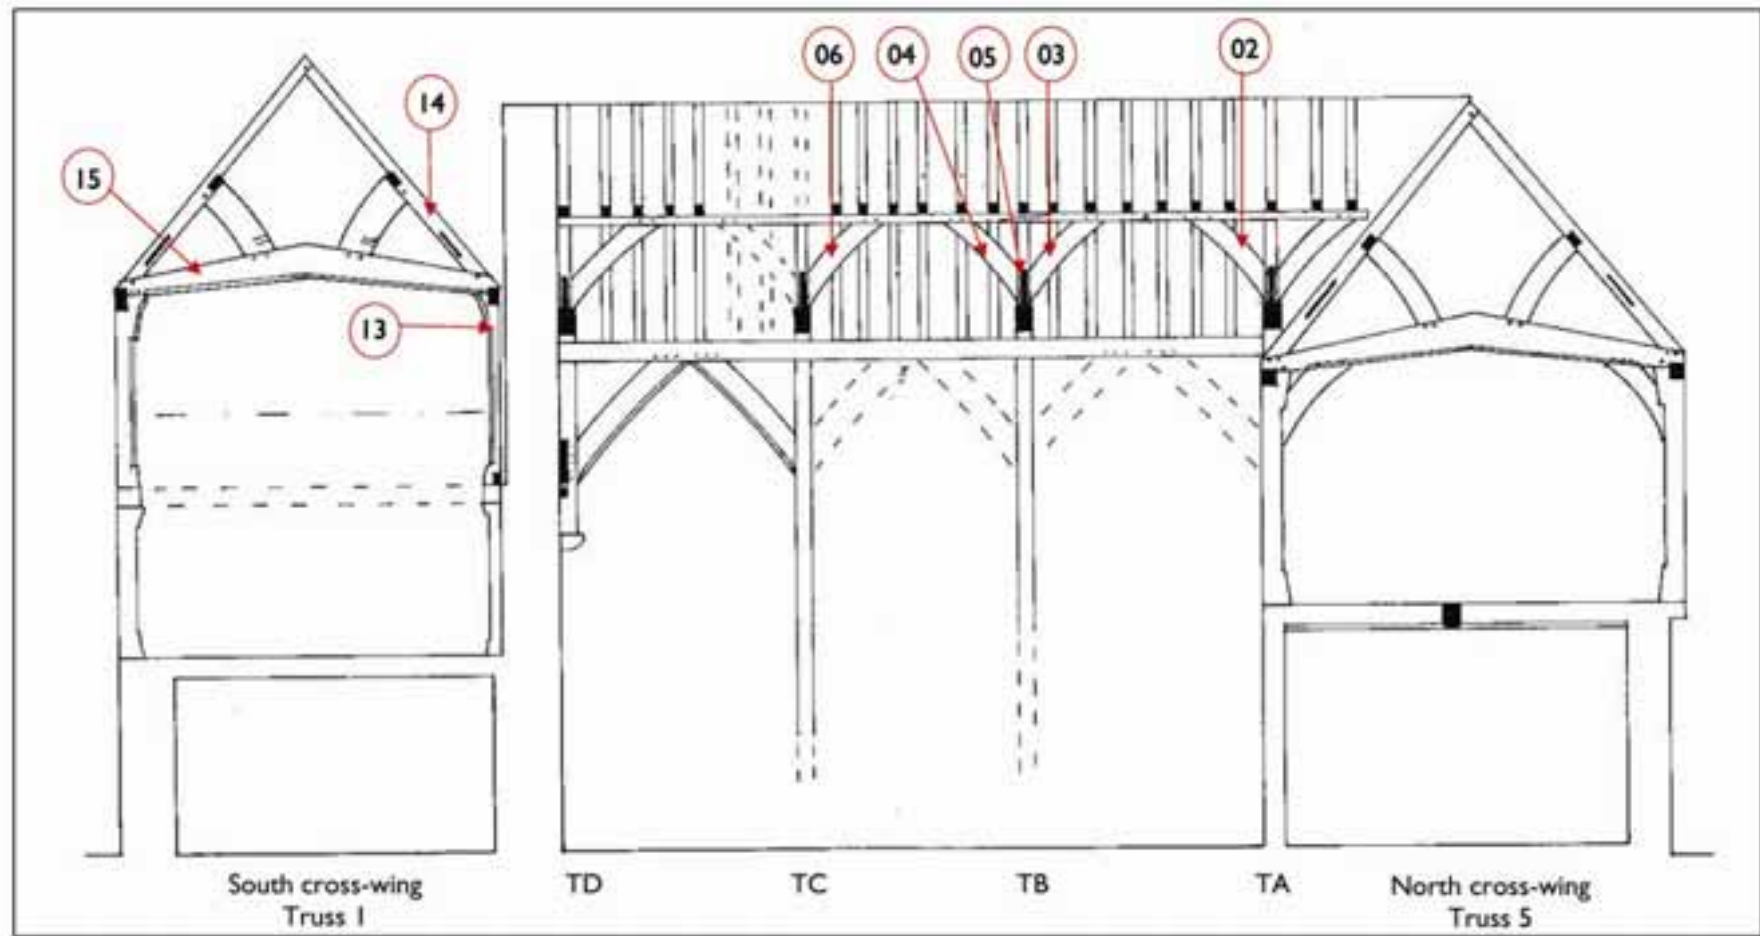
East elevation showing sample locations (based on a drawing provided by N Hill)
